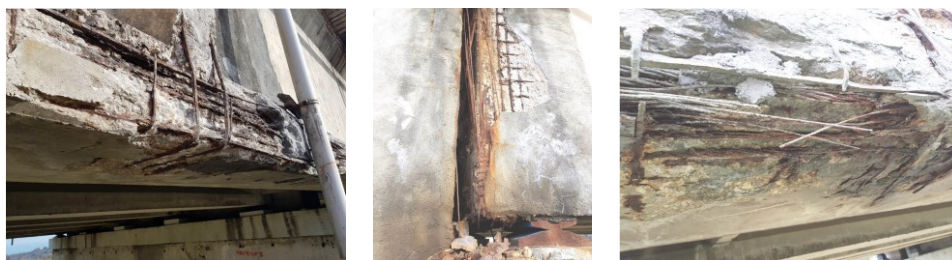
Example of condition status detected during bridge inspections (e.g. for structural beams and support devices).
